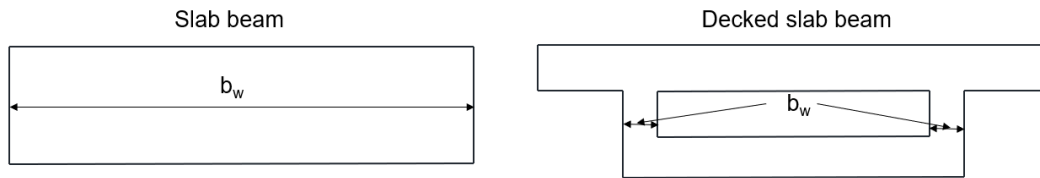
The different cross-section between slab beam and decked-slab beam
